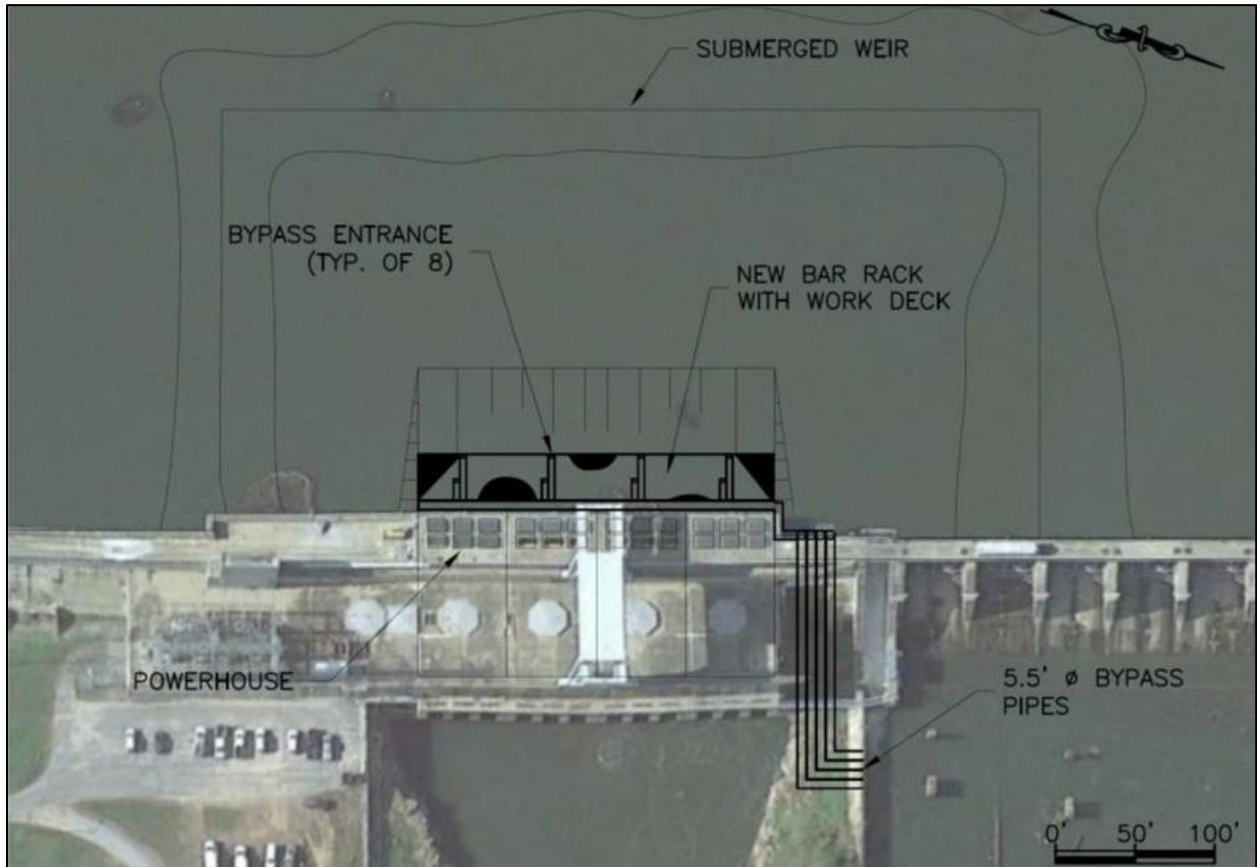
Conceptual design of new intake bar rack alternative at Roanoke Rapids (plan view).
